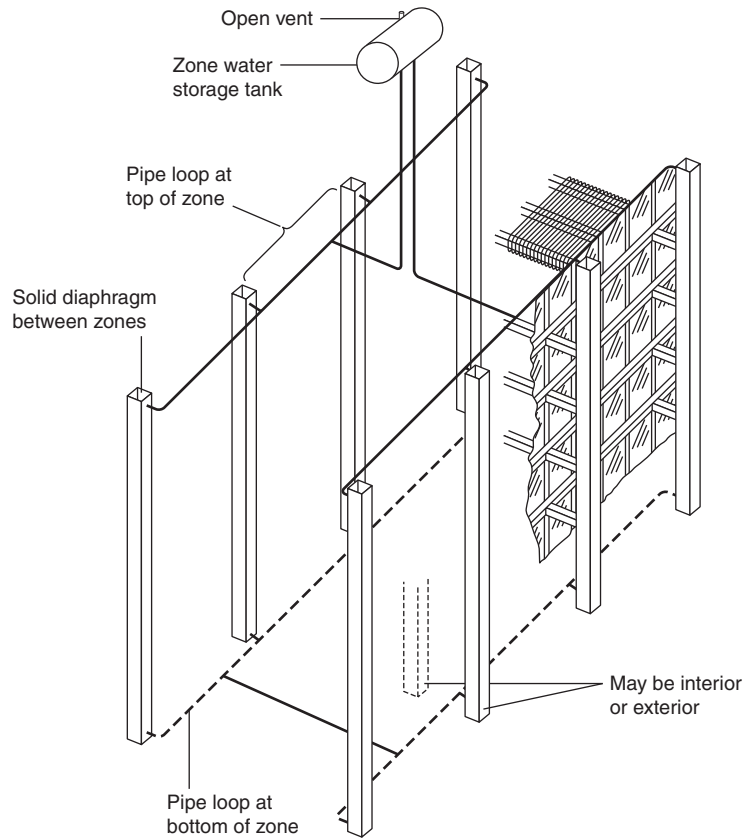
Schematic layout of a typical piping arrangement used in a liquid-filled column fire-protection system.⁴
